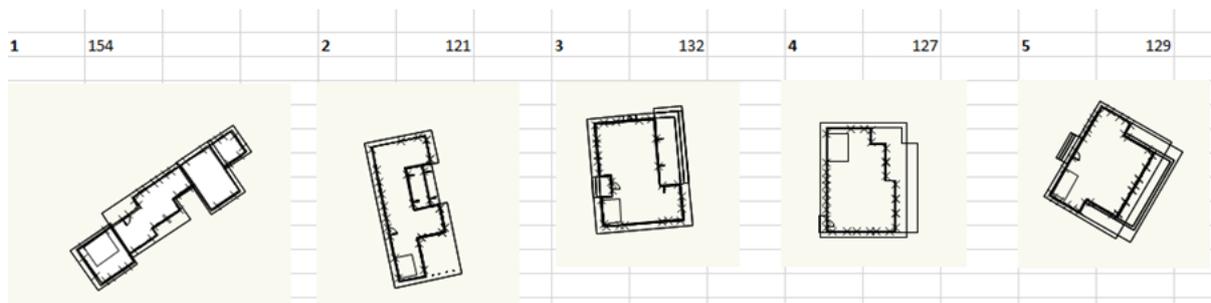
Plan view of housing footprints used in the visual simulations. The numbers above each floor plan indicate the floor area in m².
